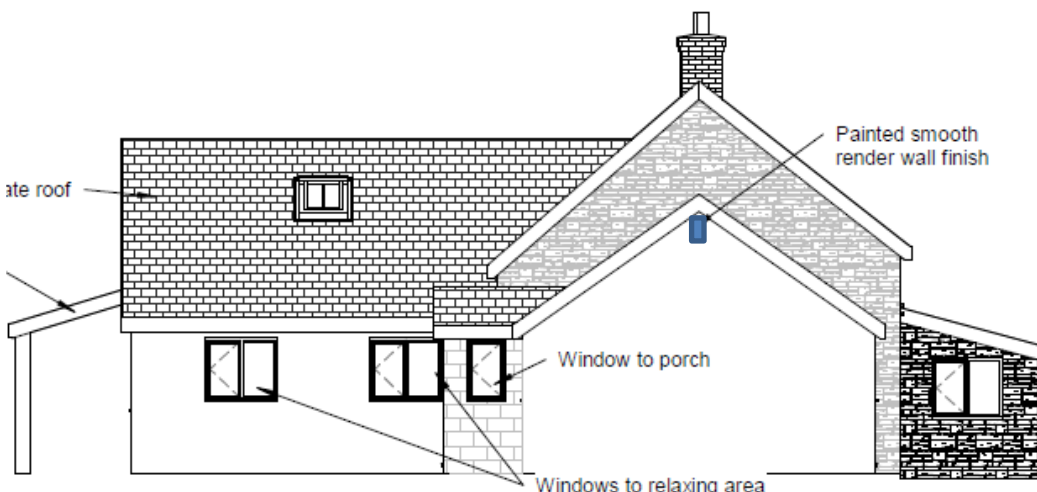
Southeast gable and extension gable showing proposed bat box location (blue box).
